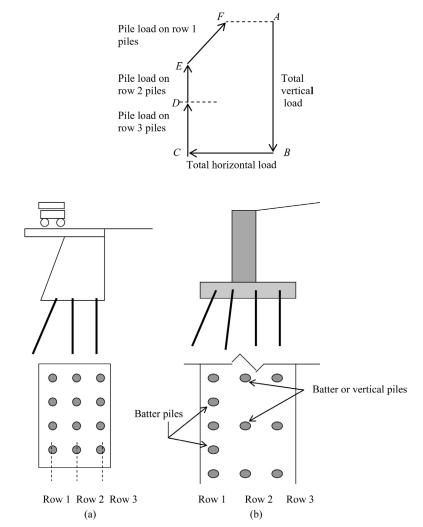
Batter piles. (a) Bridge abutments; and (b) typical profile for retaining wall with batter piles.
